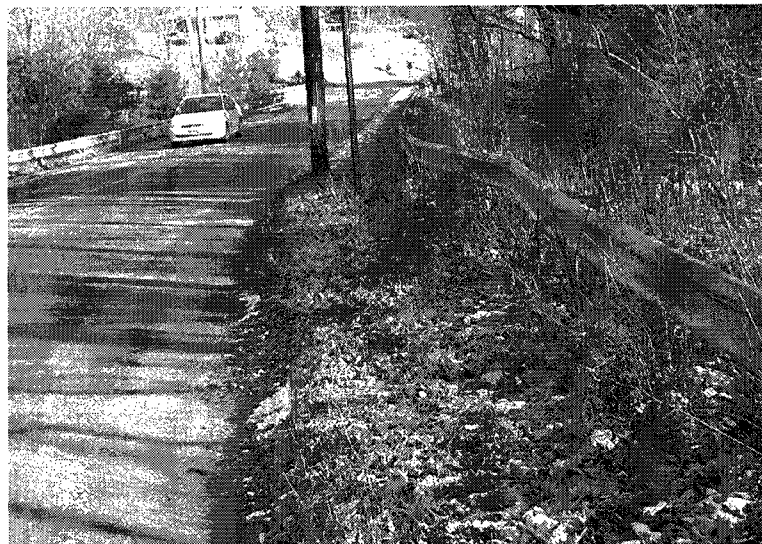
Guardrail at southeast corner has some minor collision damage.
